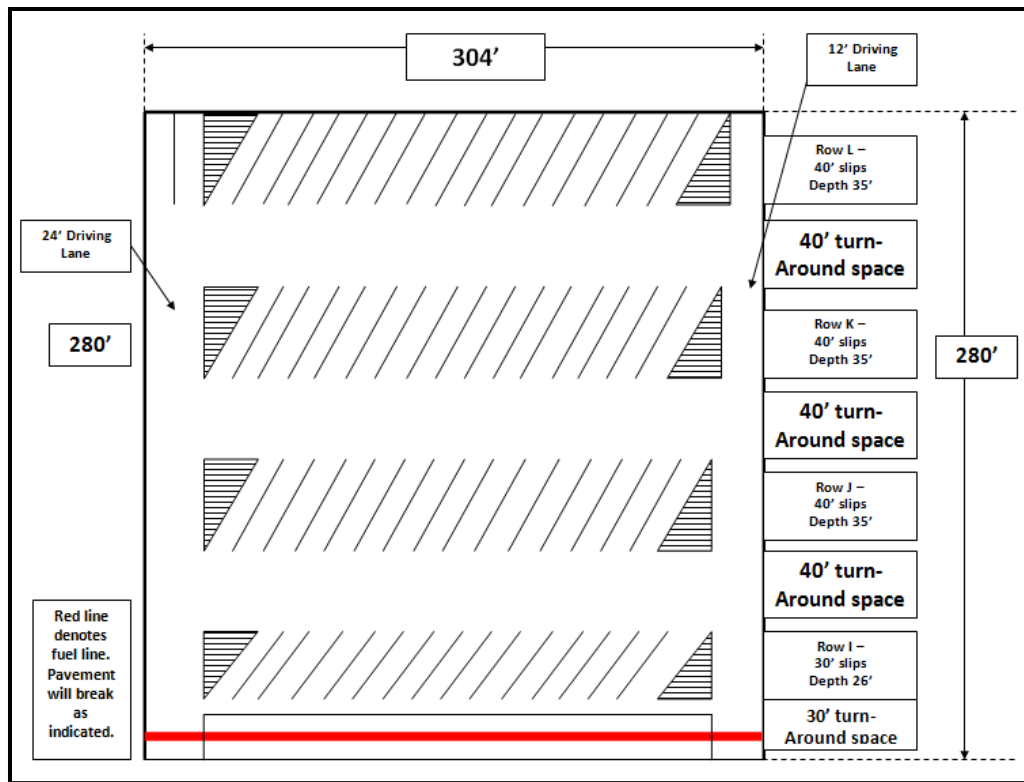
RV Storage Lot Expansion Pavement and Striping Plan
